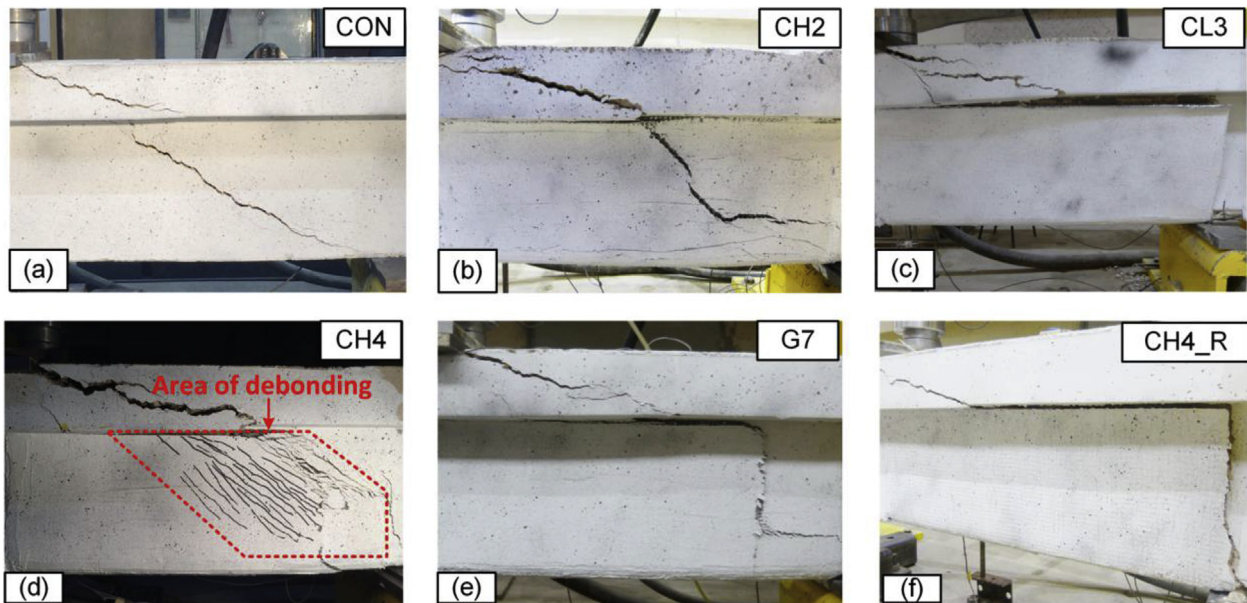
(a) Dominant shear crack in the control beam; (b) local damage of the jacket in specimen CH2; (c)–(e) specimens CL3, CH4 and G7 – debonding of the TRM jacket: peeling off of the concrete cover; (f) debonding of the FRP jacket.
